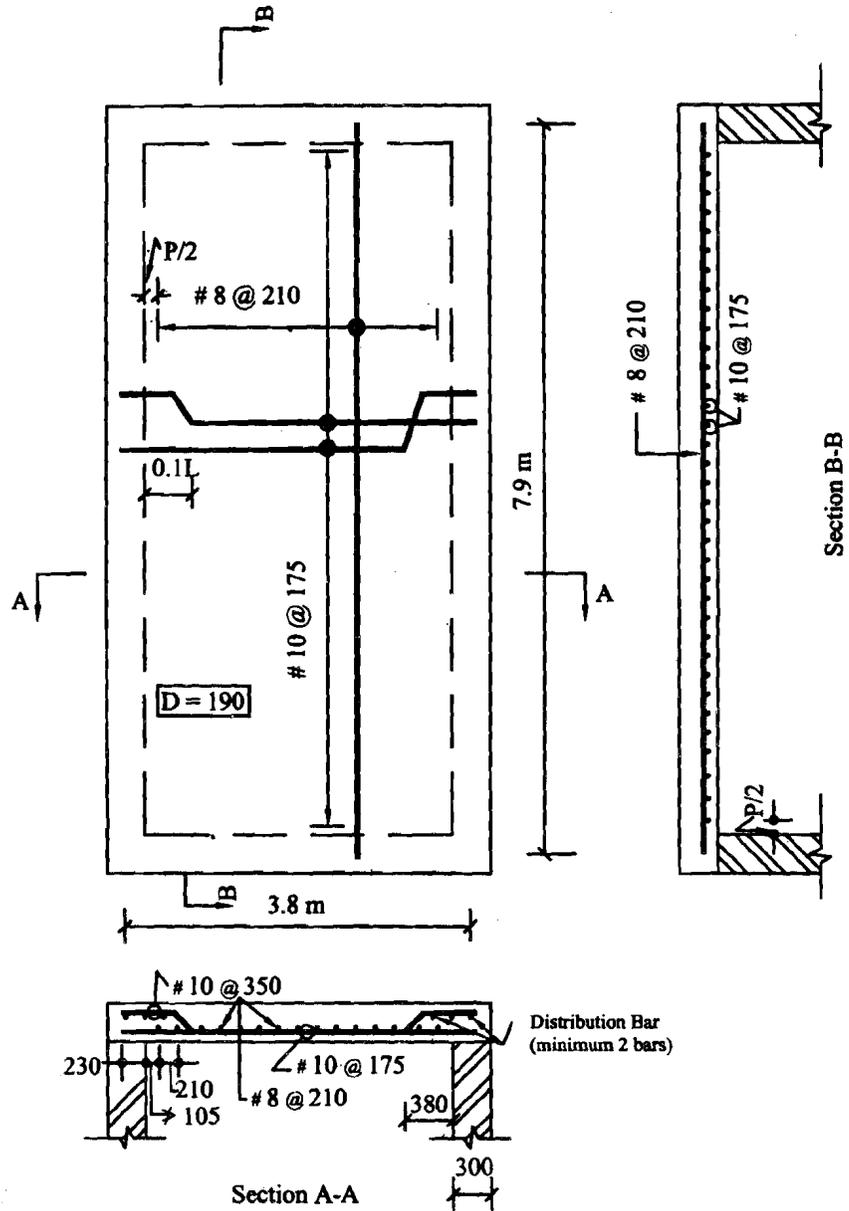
Reinforcement Detailing of the Designed Slab
